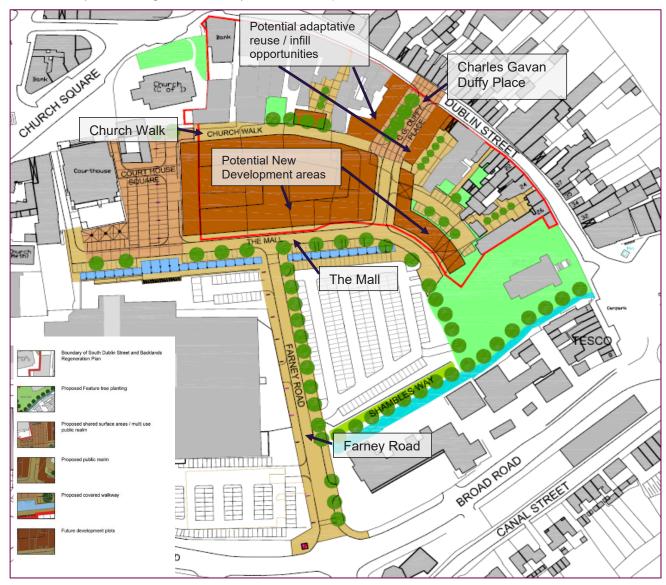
Dublin Street Regeneration Plan - Design Concept
